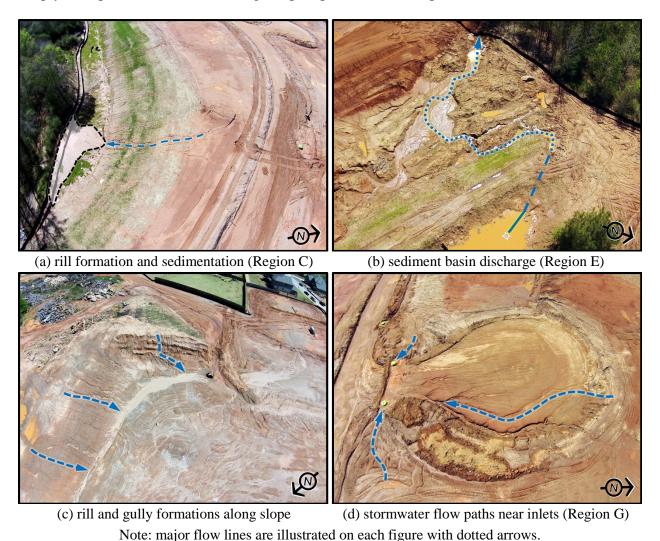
Stormwater Routing Aerial Vantage Points, 4/20/14.
